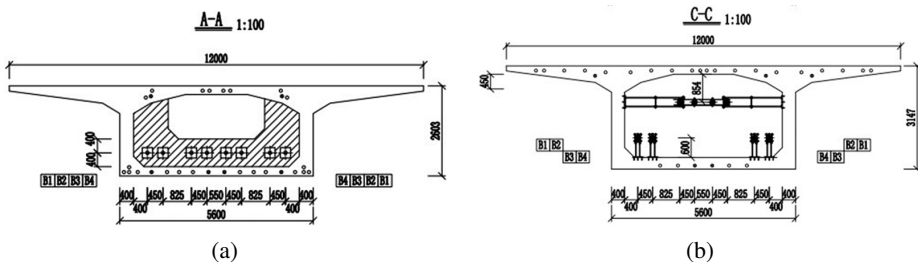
Cross section view of external prestressings: (a) Section A-A; (b) Section B-B
